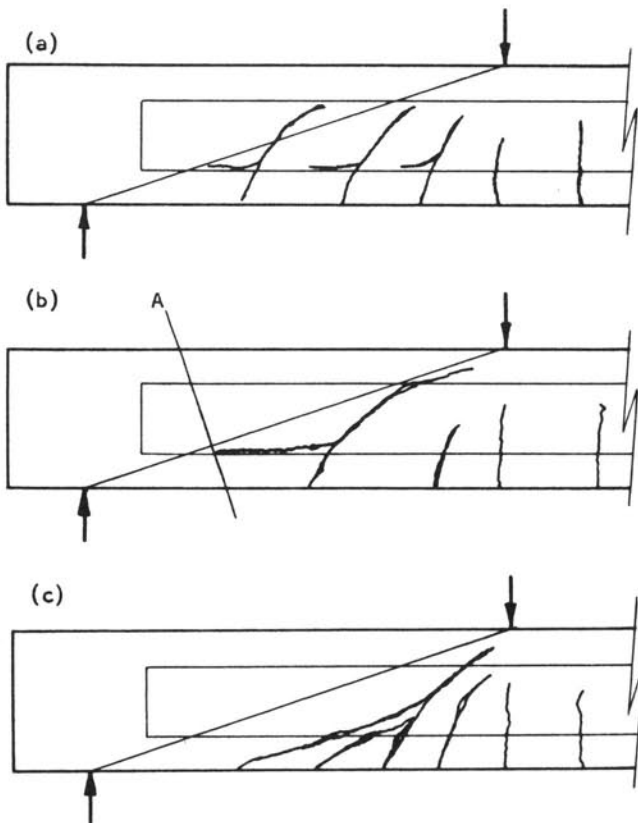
IDEALIZED CRACK PATTERNS LEADING TO WEB-DISTRESS AND SHEAR-COMPRESSION FAILURES
